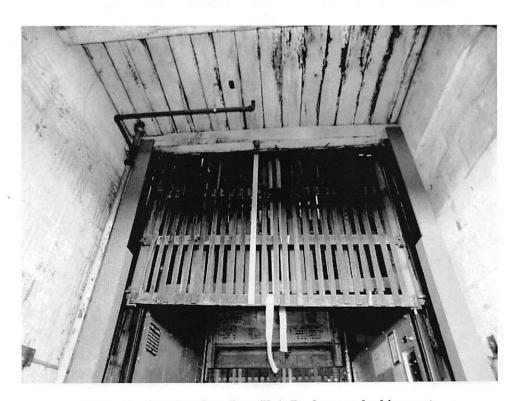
Interior, first floor Unit B, elevator, looking east.
